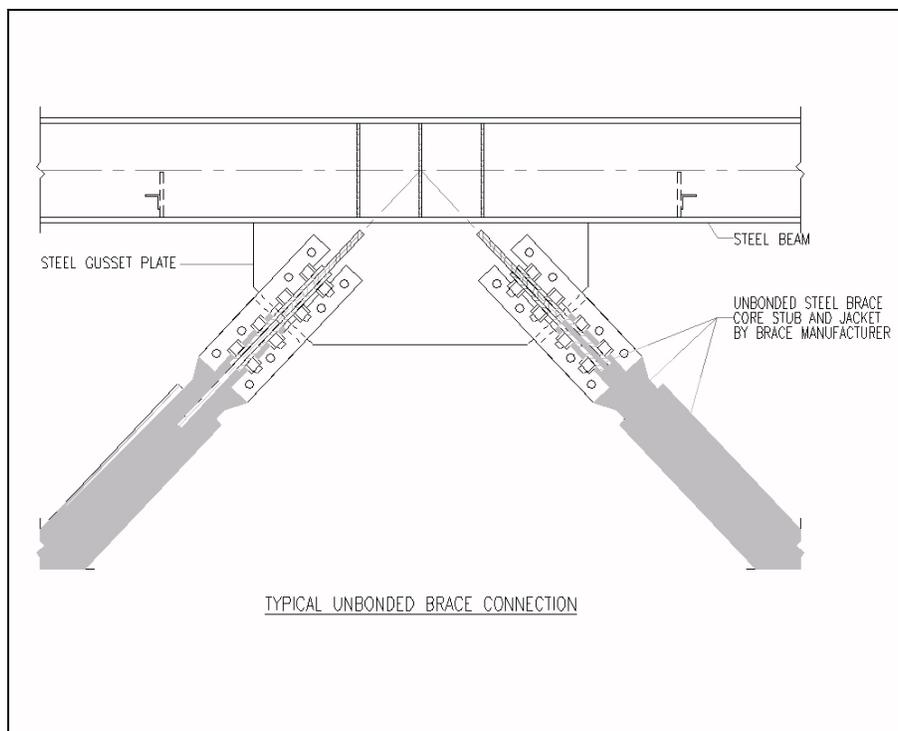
Typical Detail for Unbonded Braced Frame Connection.
